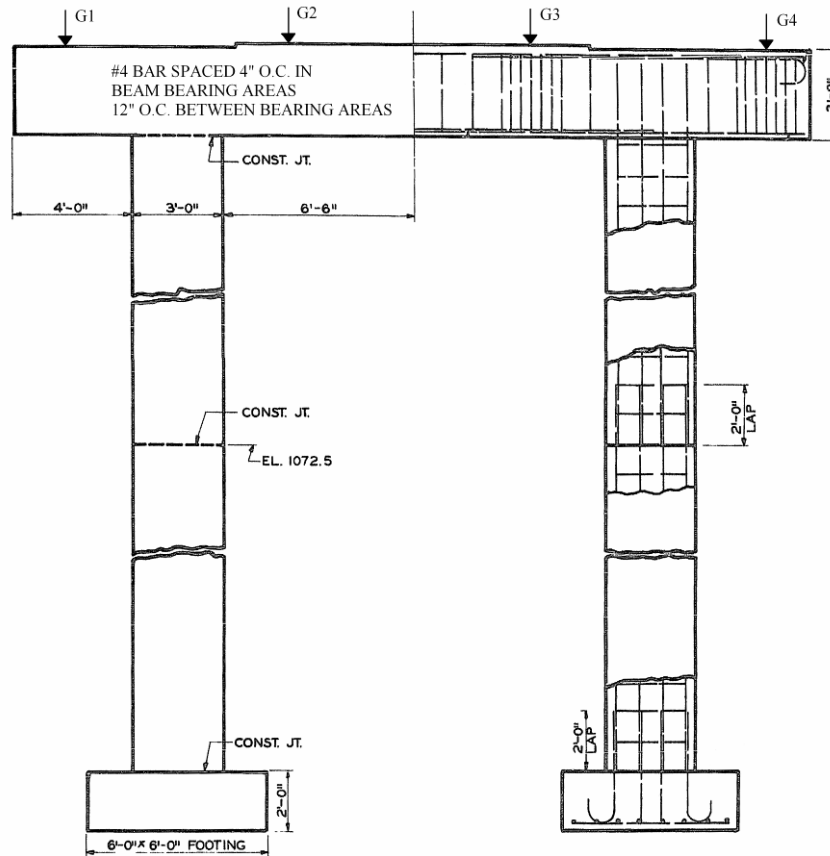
Reinforced Concrete Pier (Ref. GDOT Drawings)
